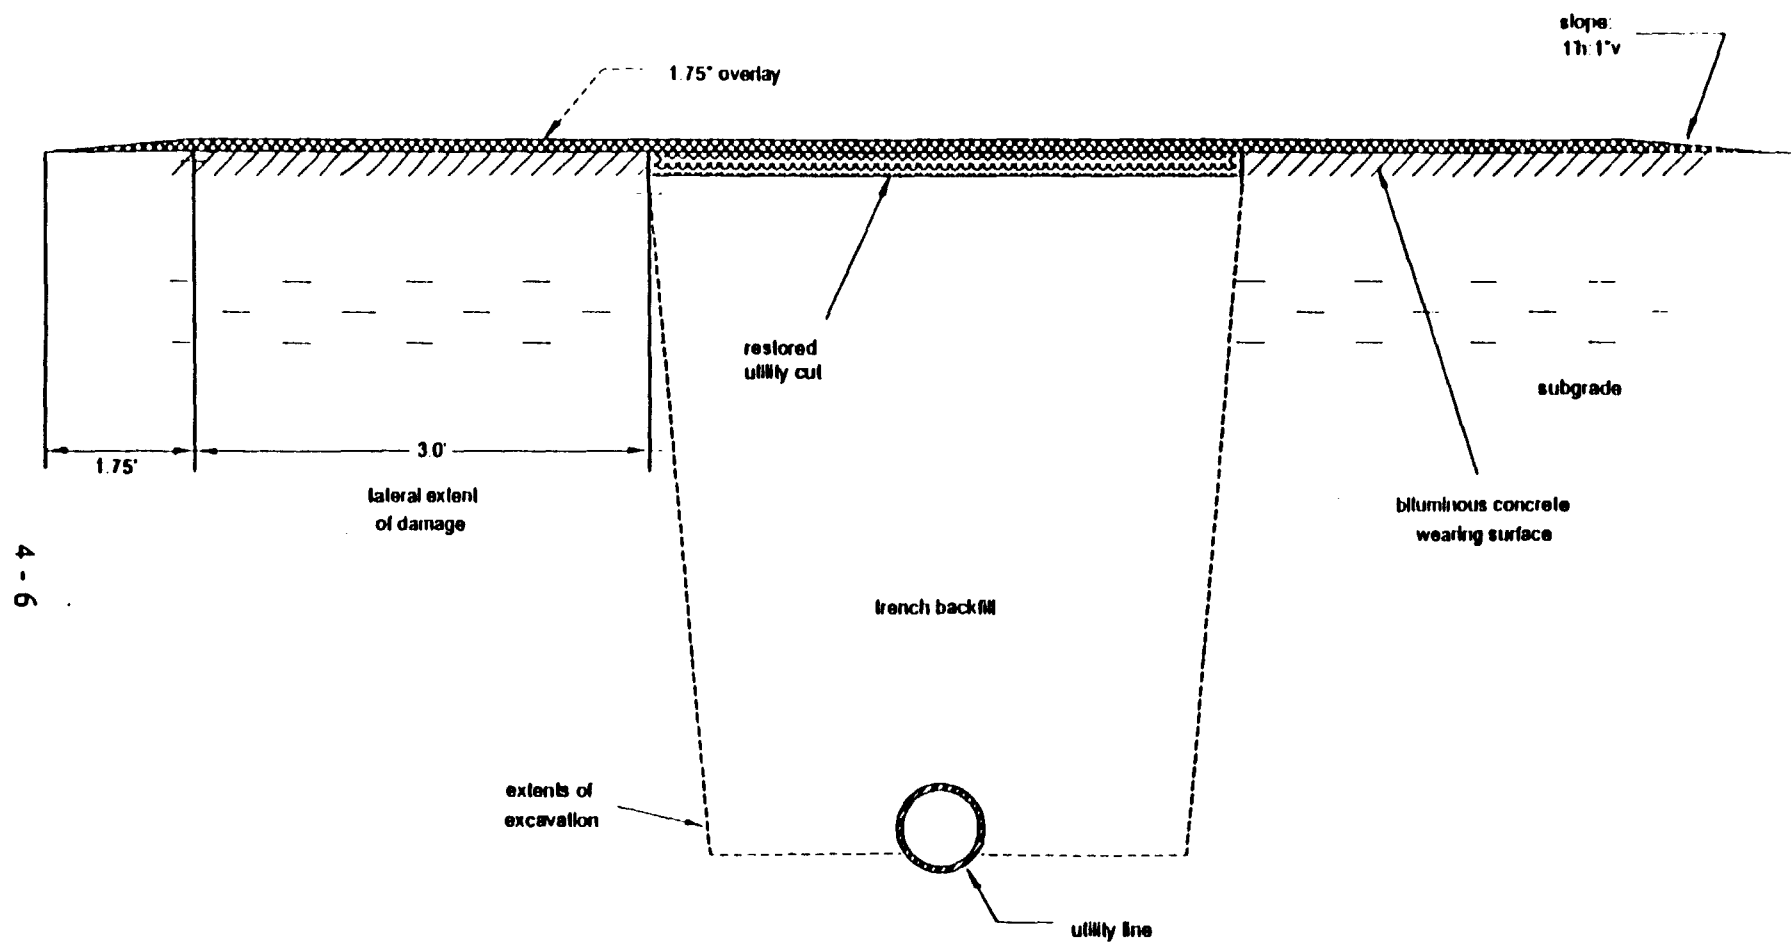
Pavement Strengthened by 1.75 in. AC Overlay - Scheme 1
